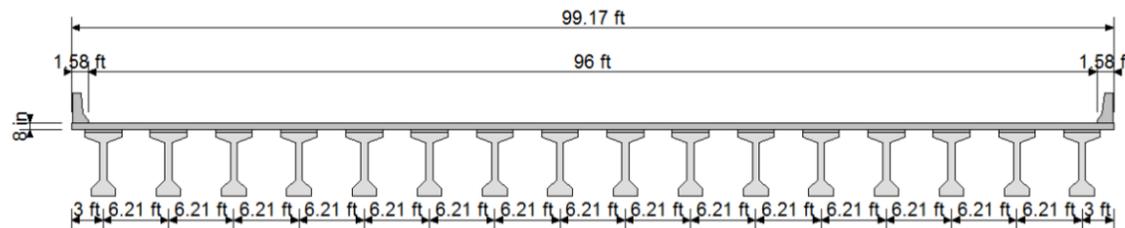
Perryville Rd. Bridge Half - Typical Section
